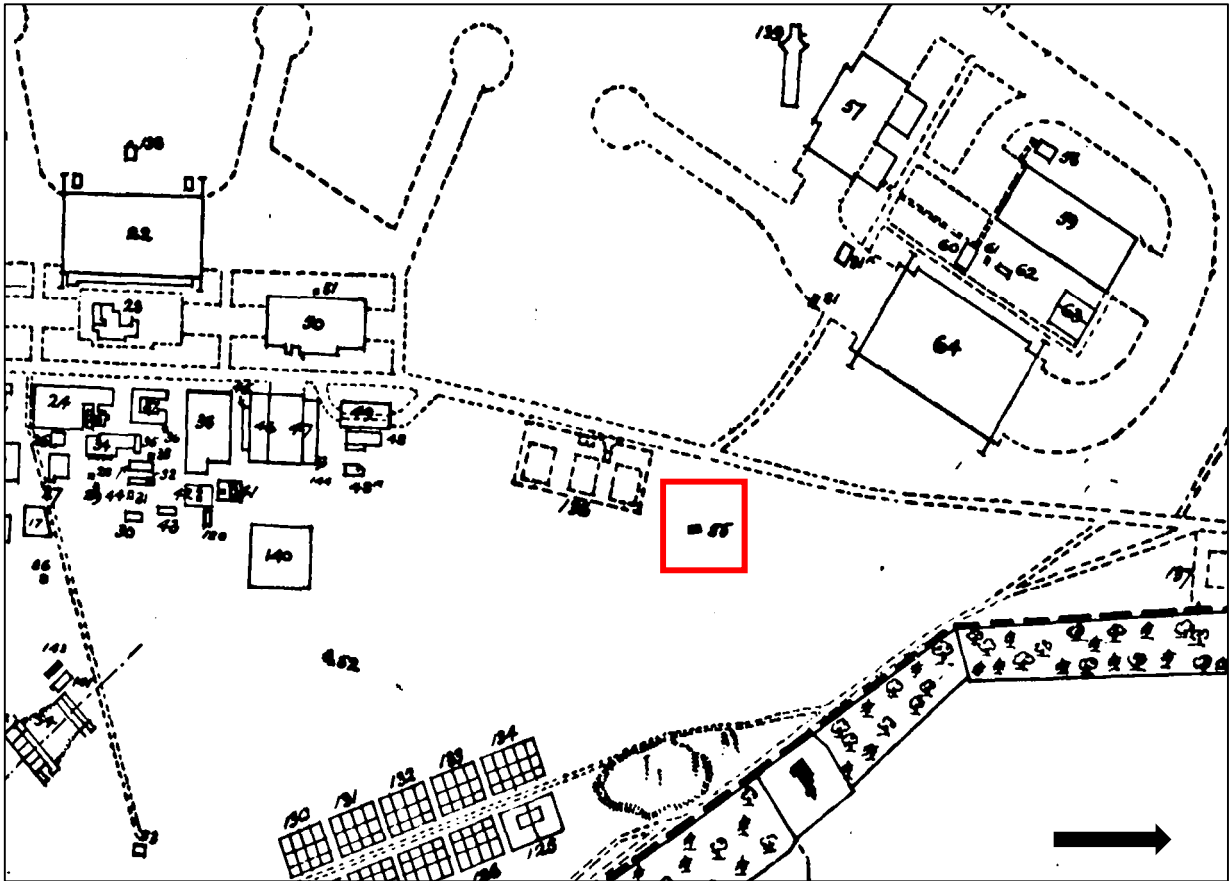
1927 Air Ministry Site Plan, building highlighted in red.
